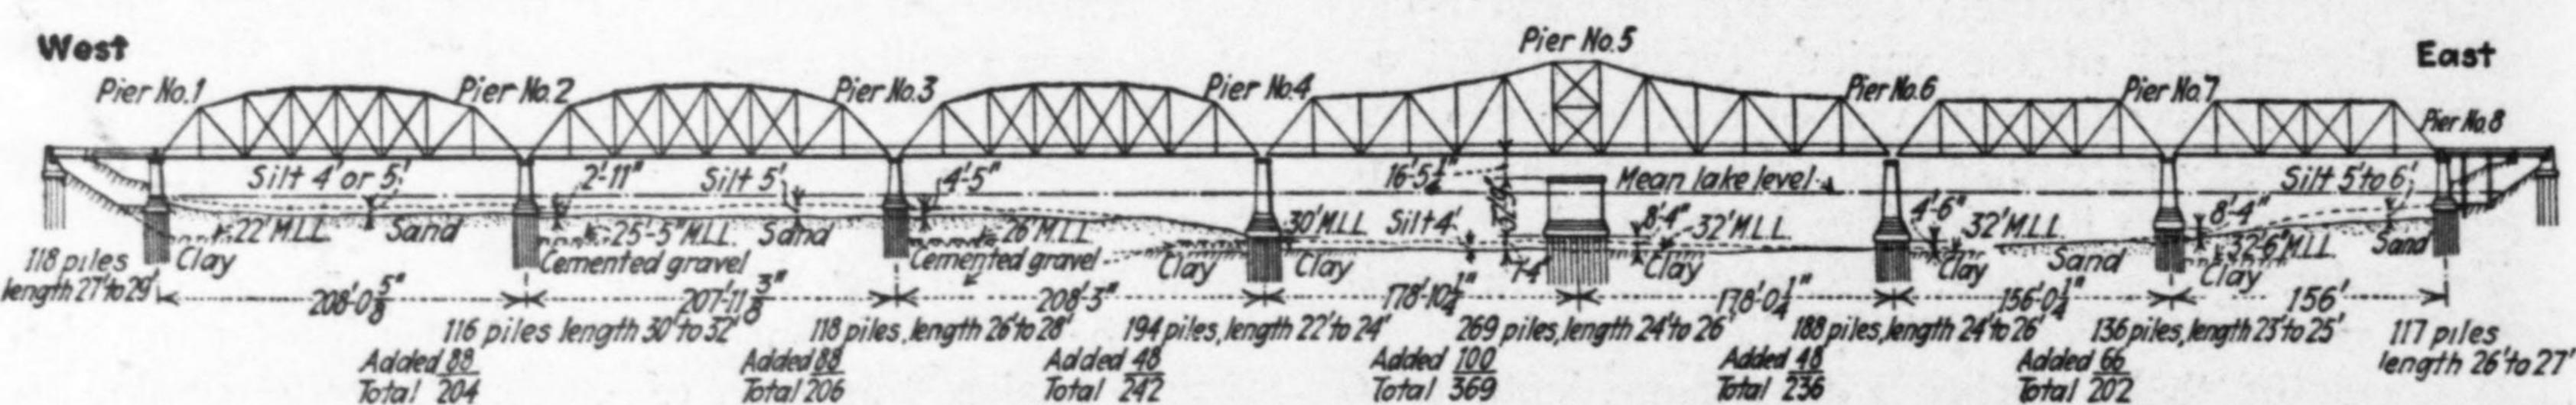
LOWER MAUMEE RIVER RAILWAY BRIDGE, TOLEDO, OHIO, SHOWING PILES ADDED FOR NEW DOUBLE-TRACK STRUCTURE
